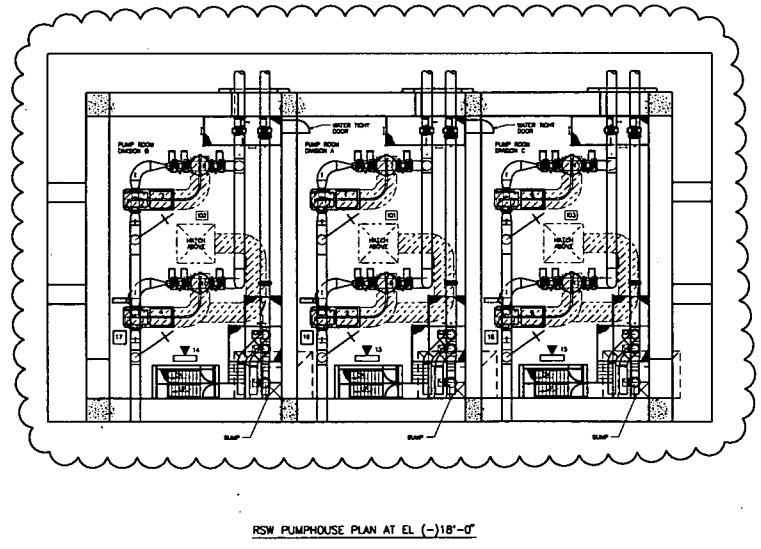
RSW Pumphouse & Tunnel Plans & Sections
